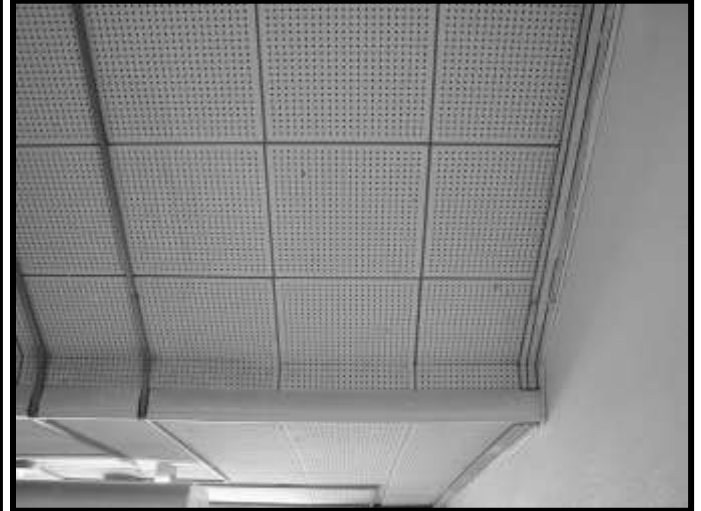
12” x 12” regular pattern ceiling tile in south stair.
